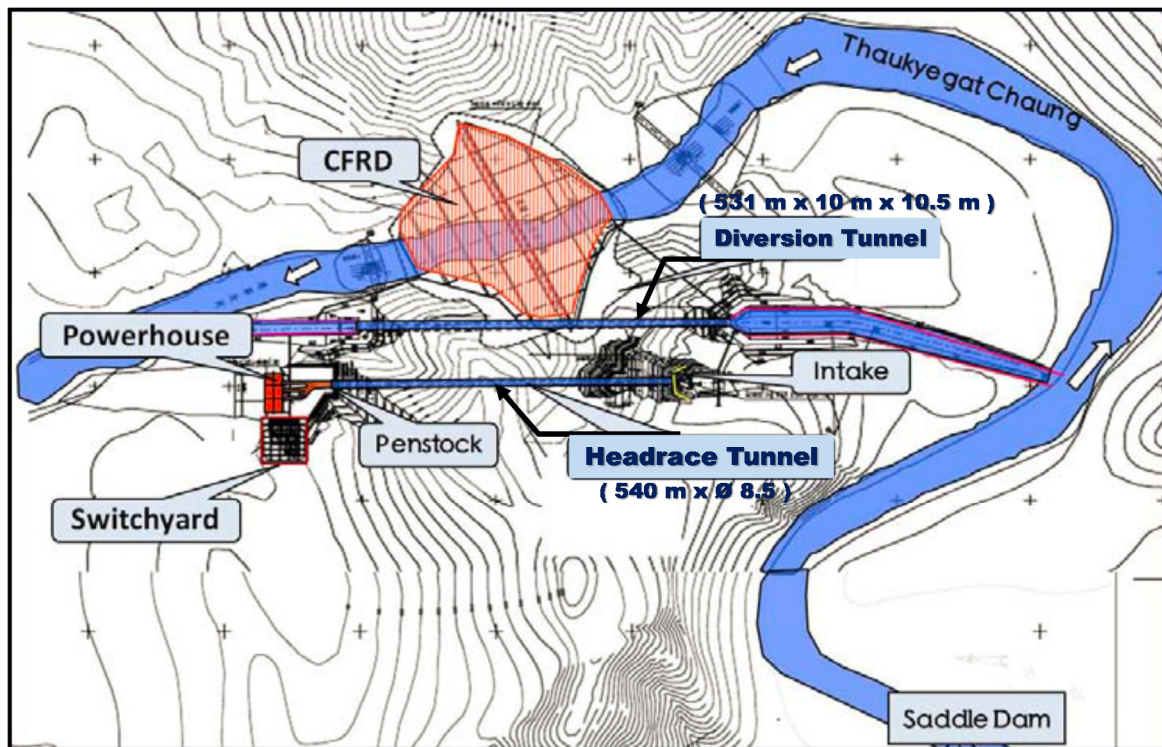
General Layout of Thaukyegat Hydropower Project (Source: DHPI, 2012)
